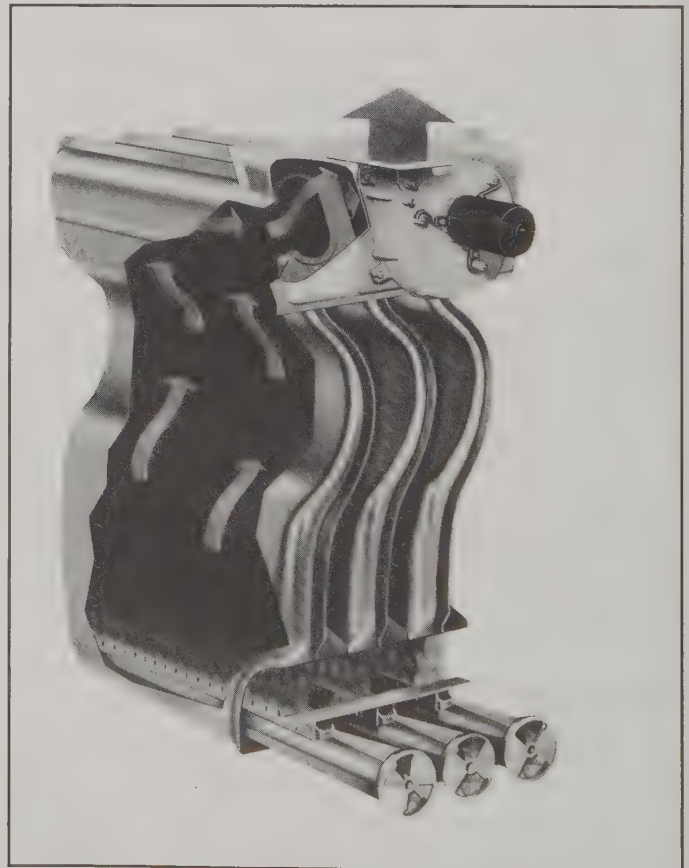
The heating section of a gas furnace includes burners built into the bottom of the heat exchanger and a venting system for the waste products of combustion. (Lennox)
